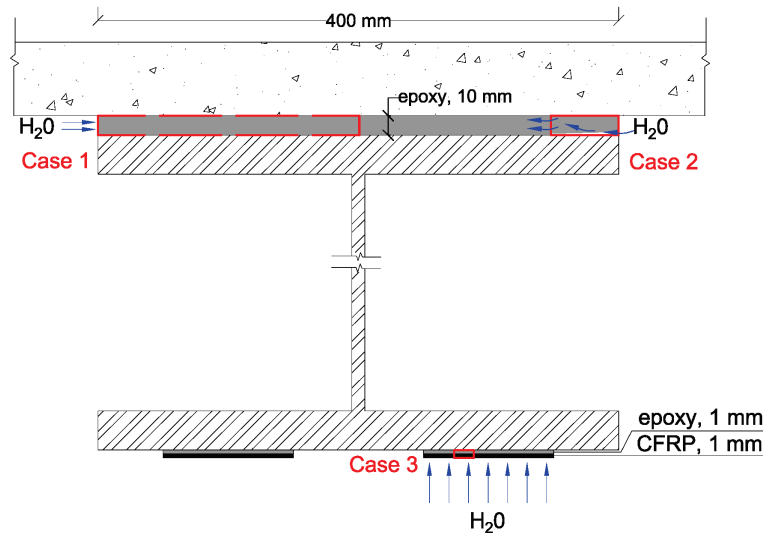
Case studies: 1) Deck-girder joint (sealant defect); 2) Deck-girder joint (interface defect); 3) CFRP-girder joint (adherend permeability).
